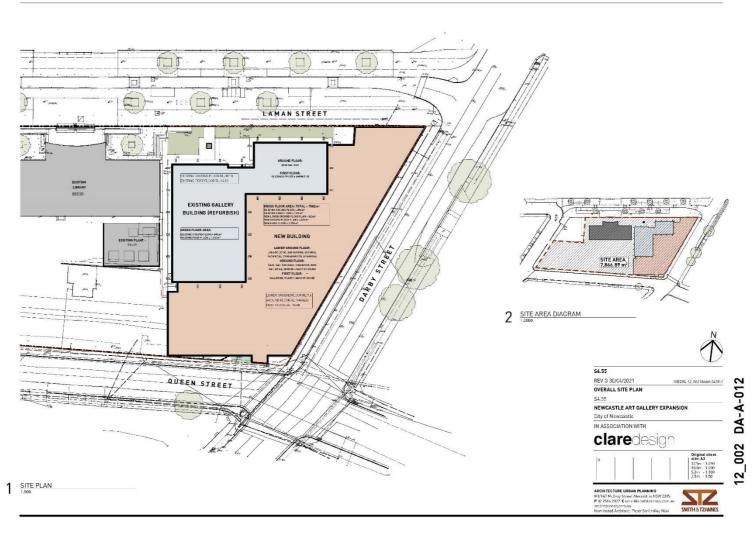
Site plan showing the location of the areas affected by new building proposed for development
